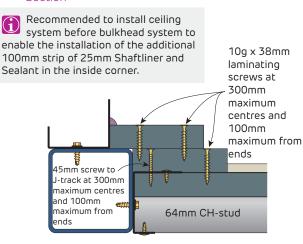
Construction of Shaft Wall L-shaped Duct
